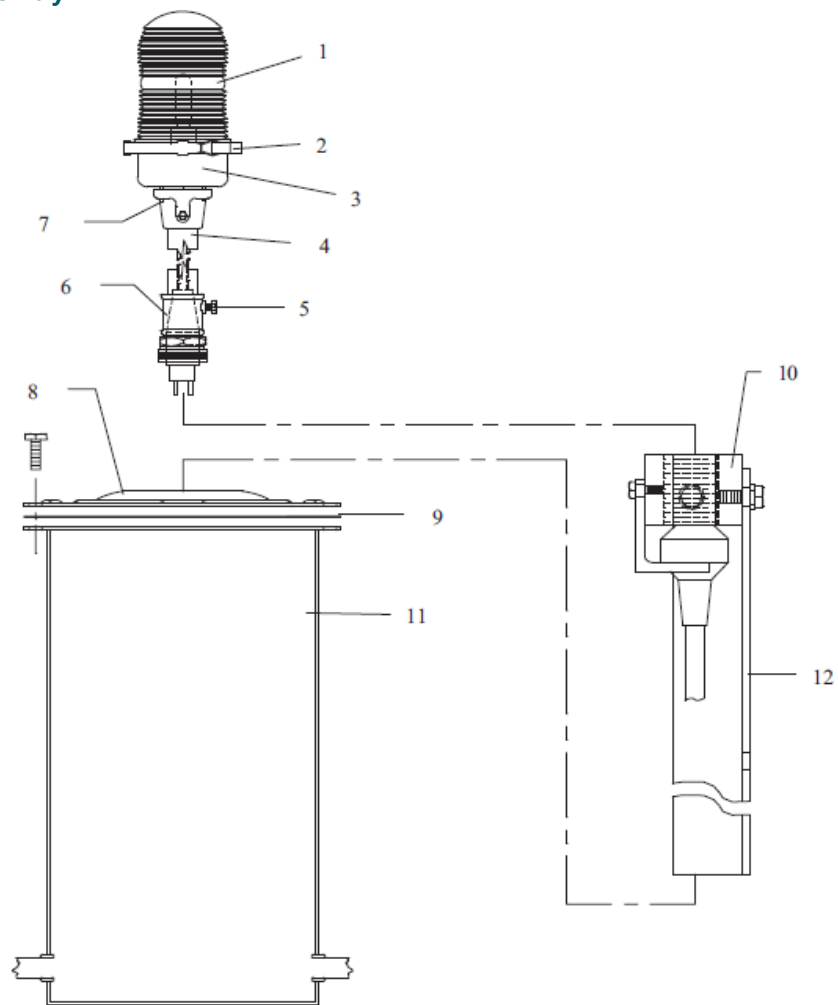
shows a head assembly with a phenolic socket. The L-861 light fixtures with porcelain and quartz sockets are similar.
